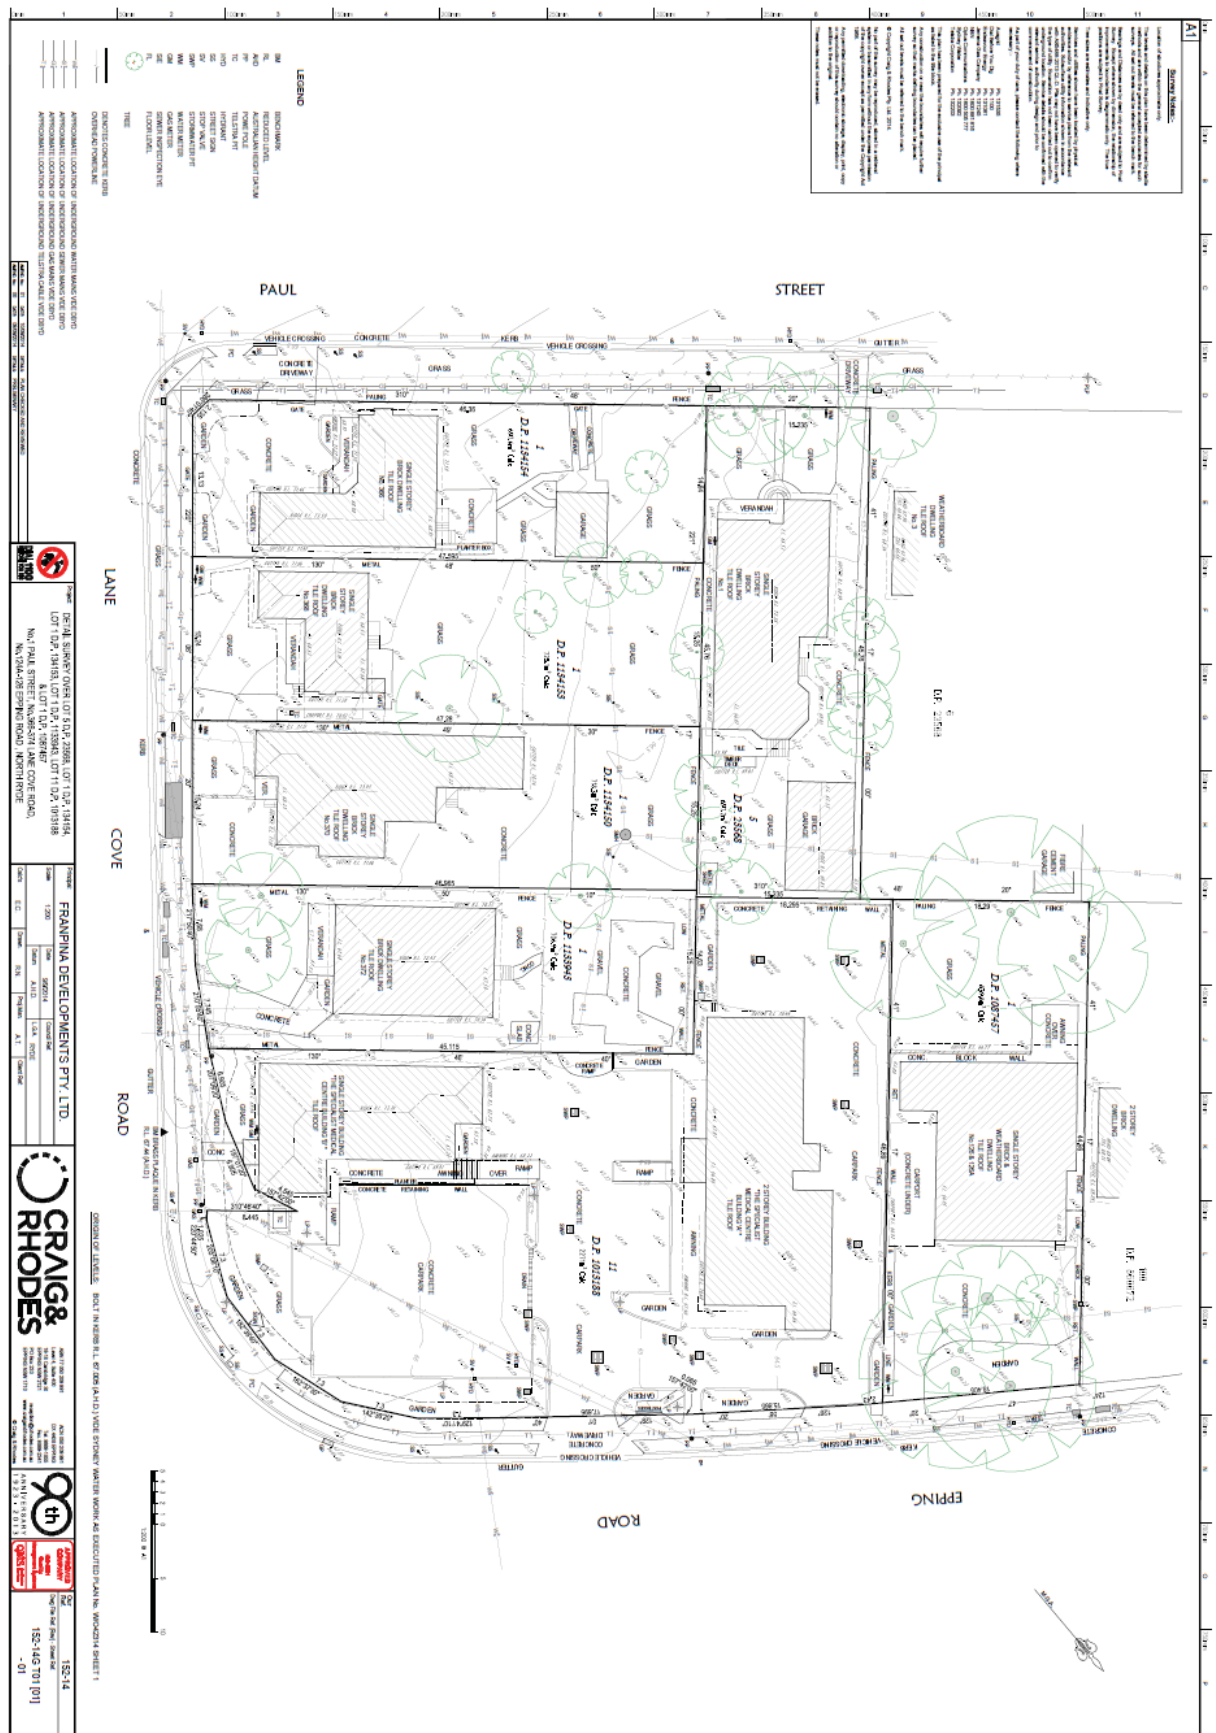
Existing Survey Plan (Craig & Rhodes)
